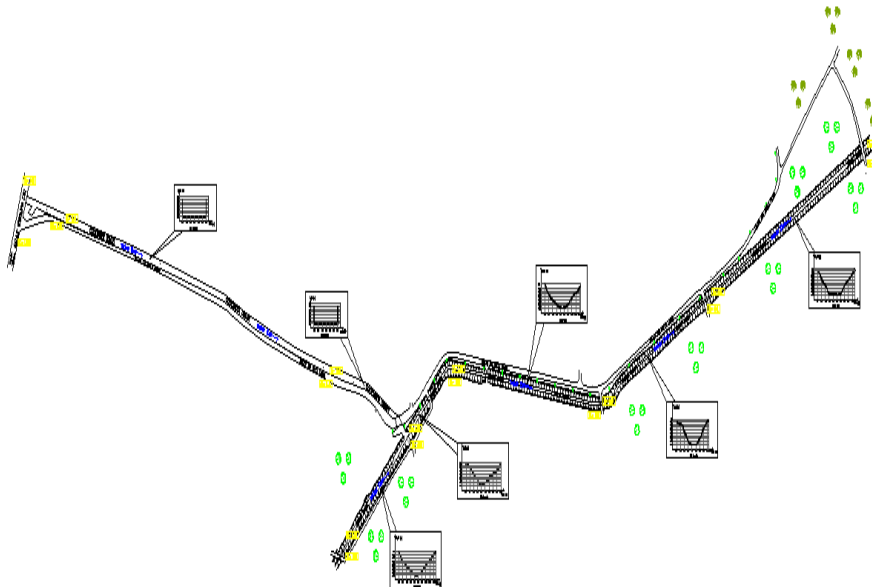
Concrete and drainage plan at Kampung Paya Lang.
